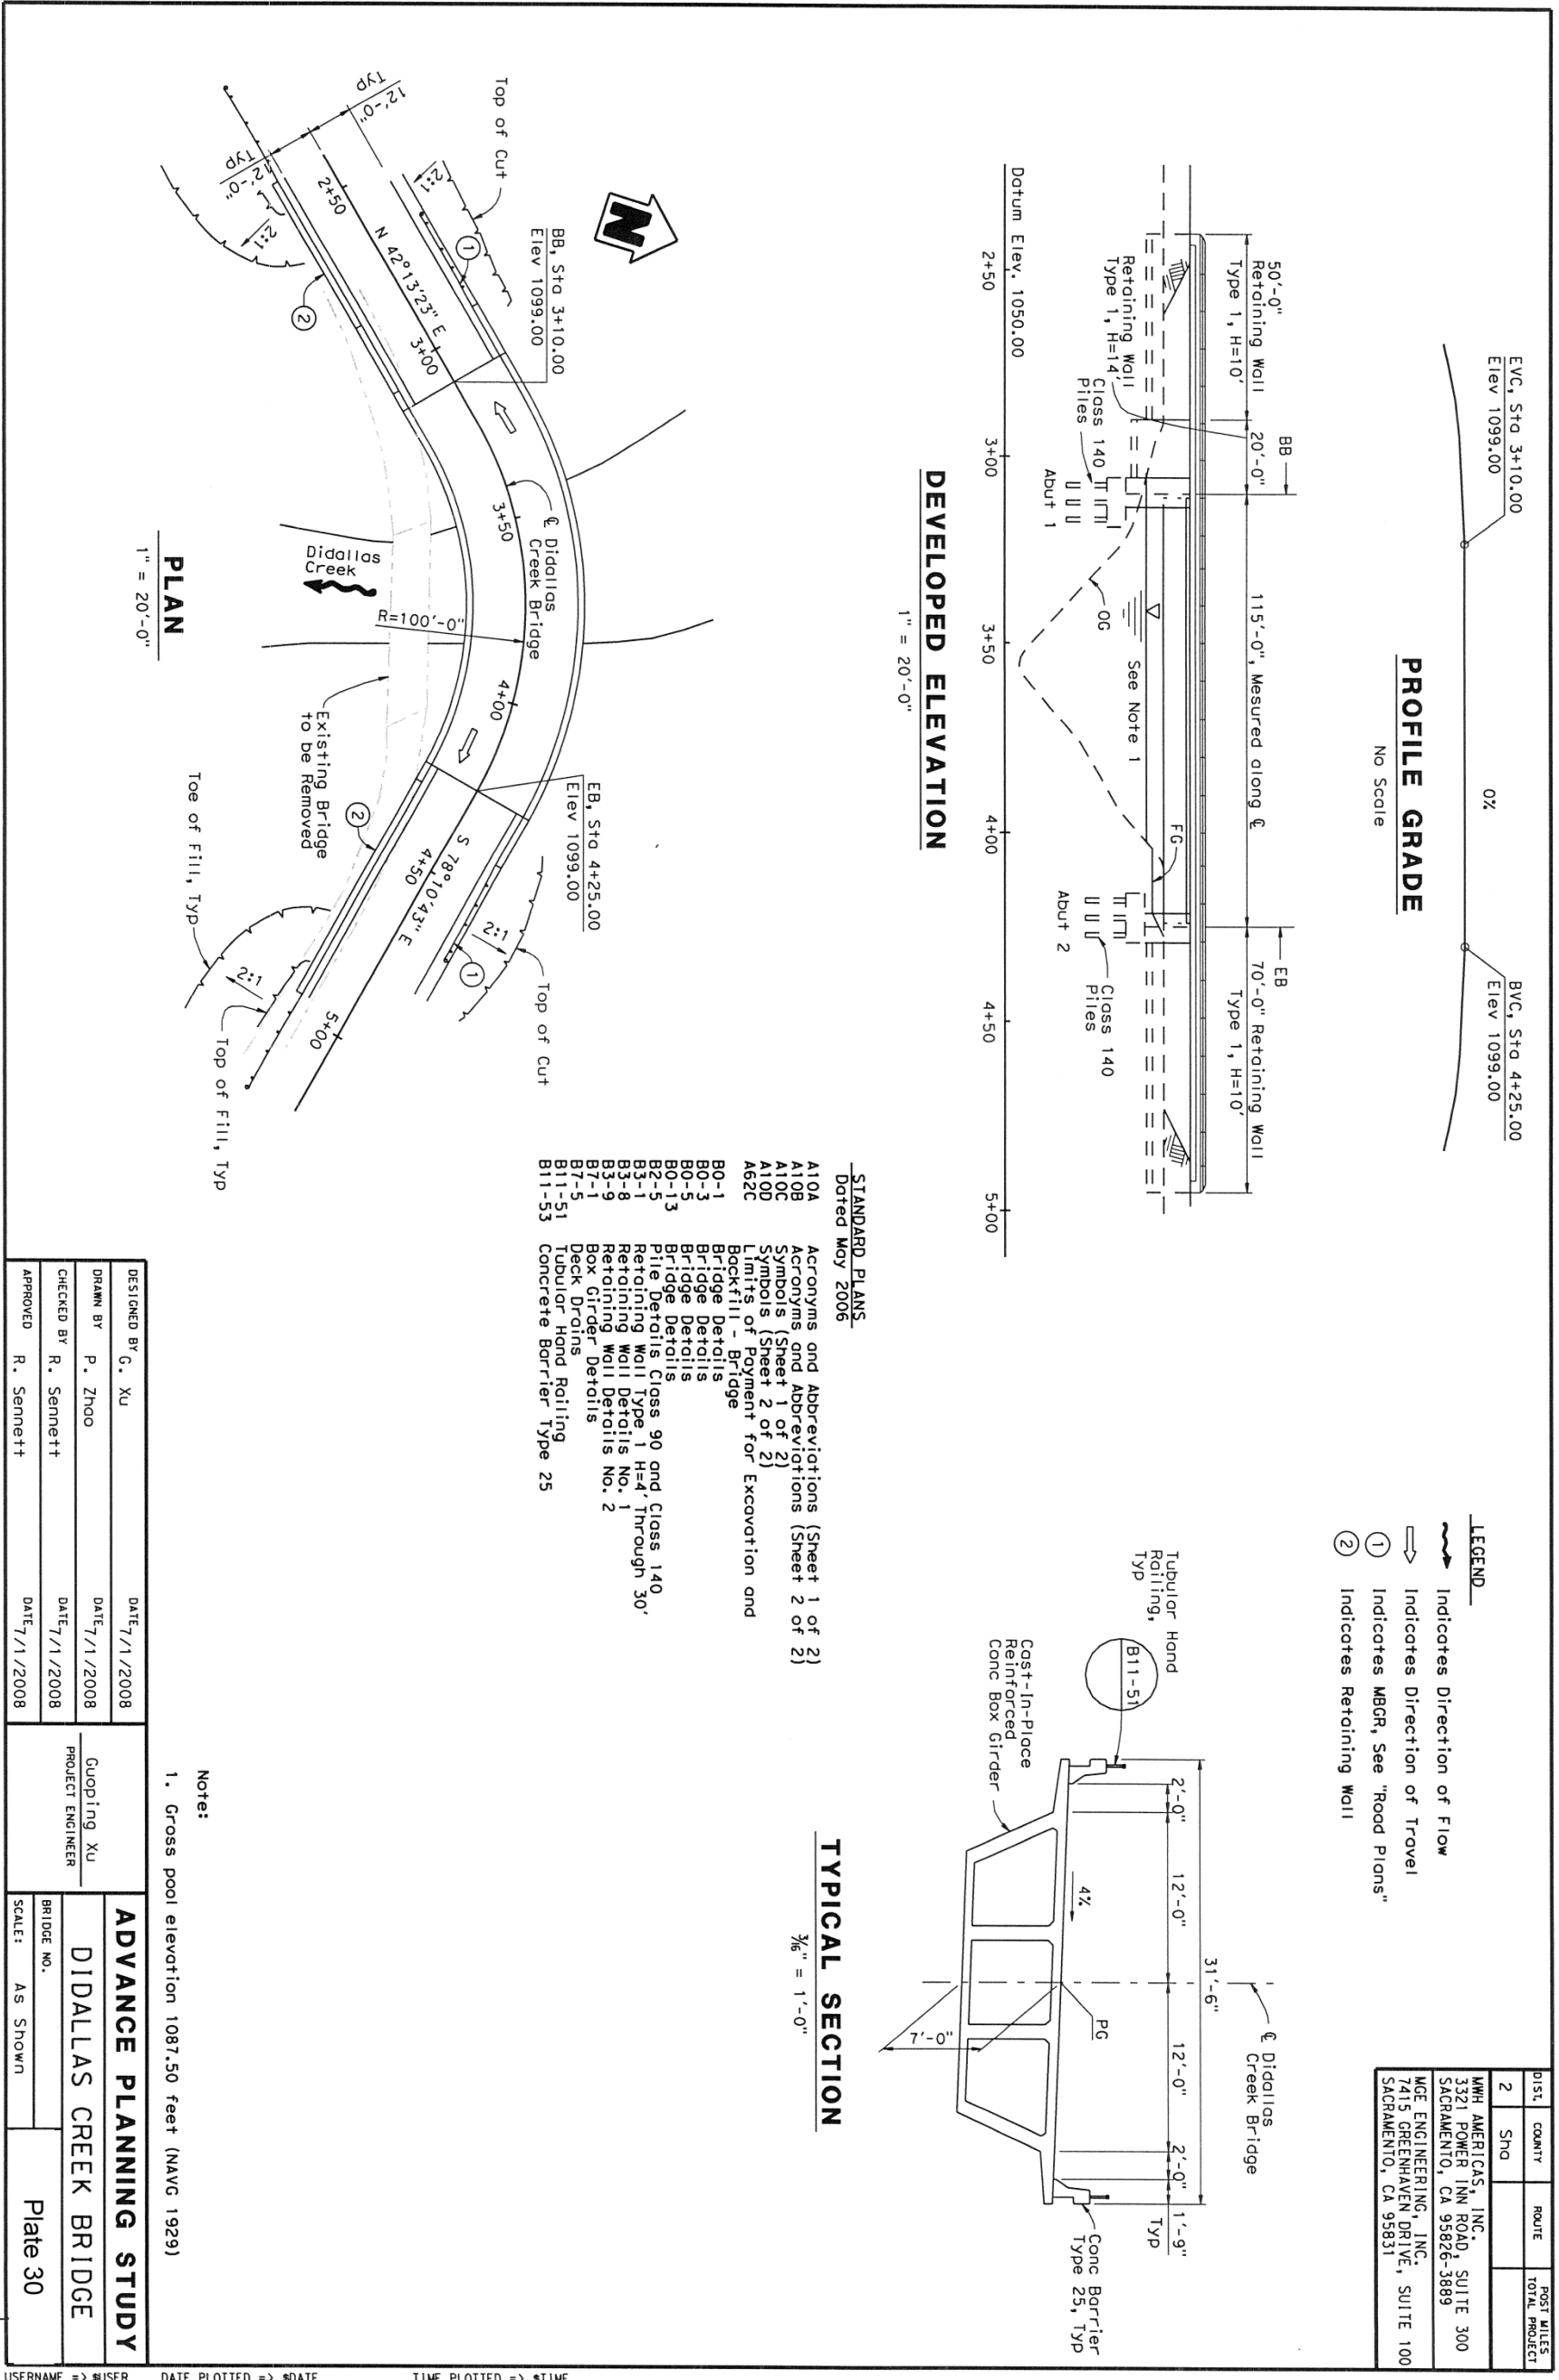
Didallas Creek Bridge – Elevation, Plan, and Section
